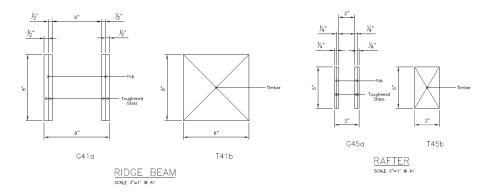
Shop Drawings Showing New Glass and Original Timber Sections Side by Side.
